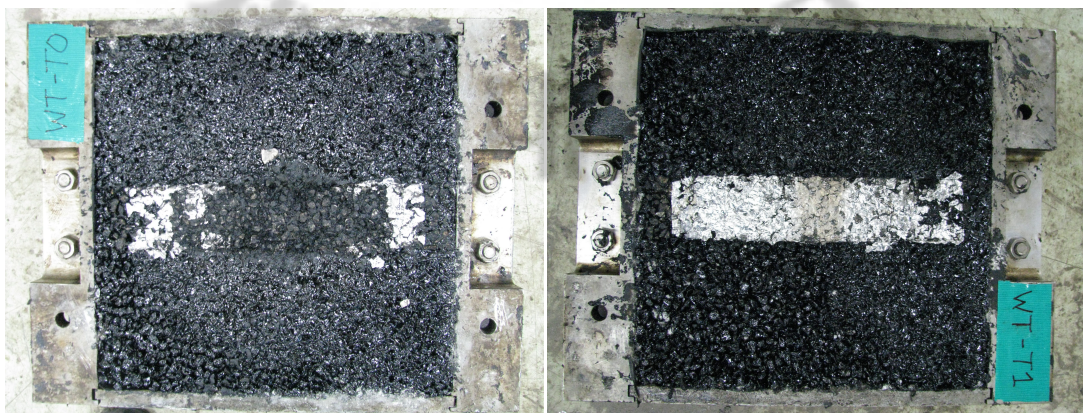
Real view of Wheel Tracking Test (Sealant)
